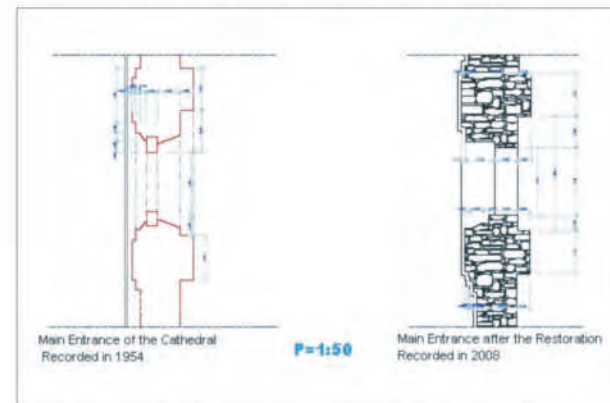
Planimetric plan of the main entrance of the Cathedral. The plan on the left shows the entrance as it was recorded in 1954 Zdravković (1956, 268); the plan on the right shows a 2008 record of the consolidation.
